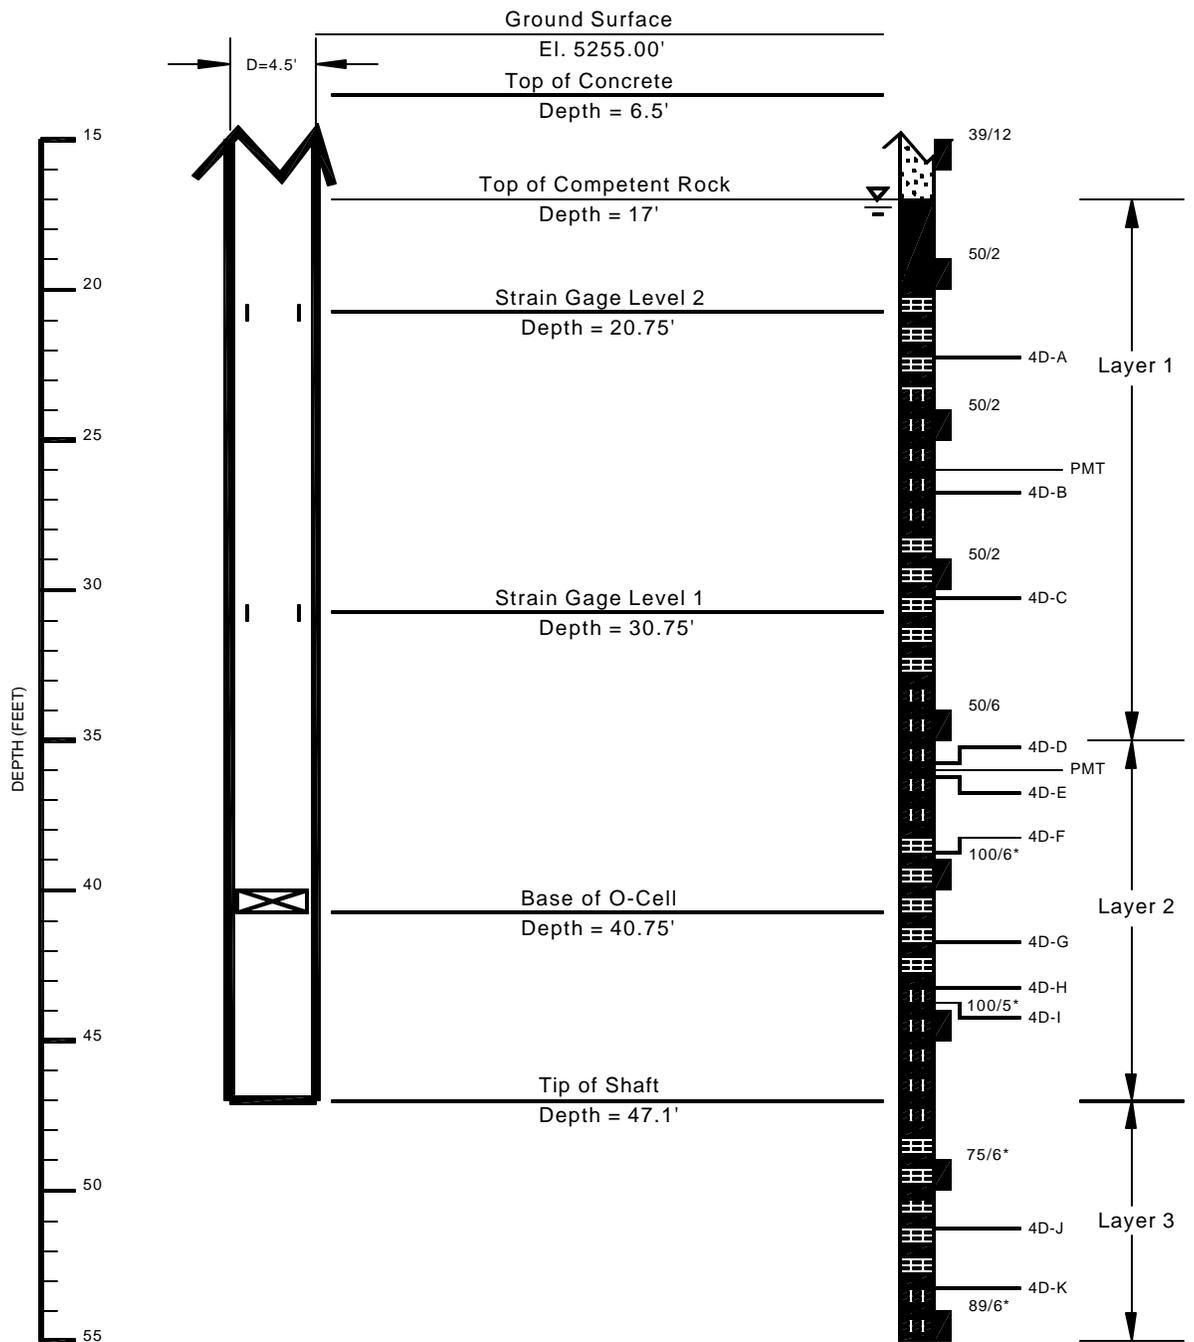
Instrumented Test Shaft Schematic and Boring Logs for Broadway Site
